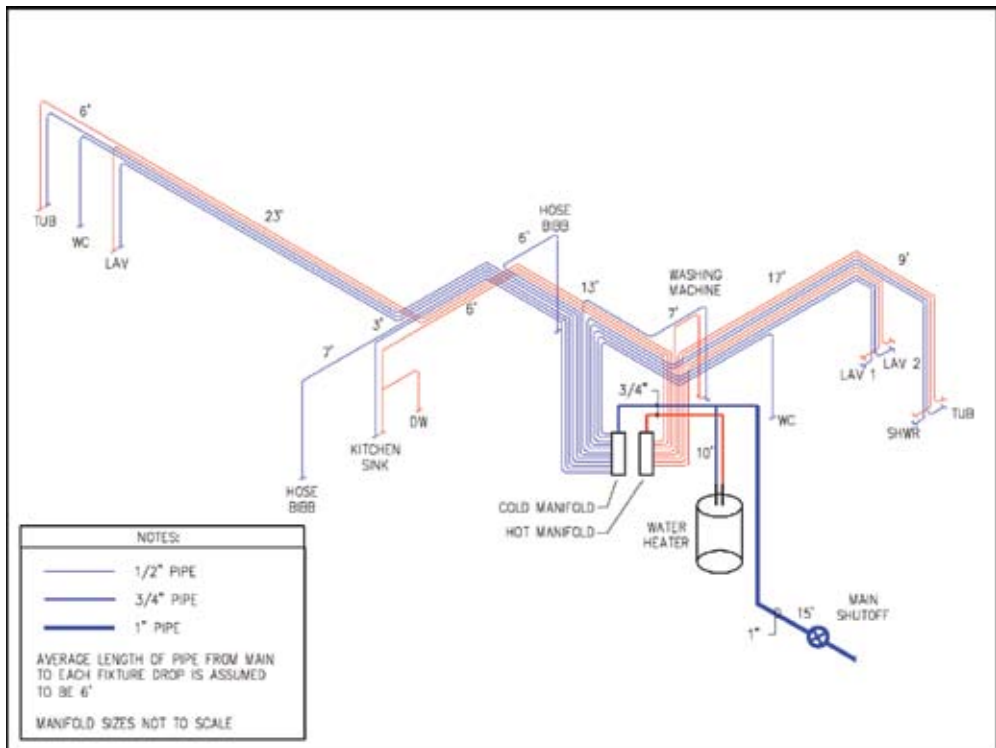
Home-Run Isometric Riser for the Ranch House
